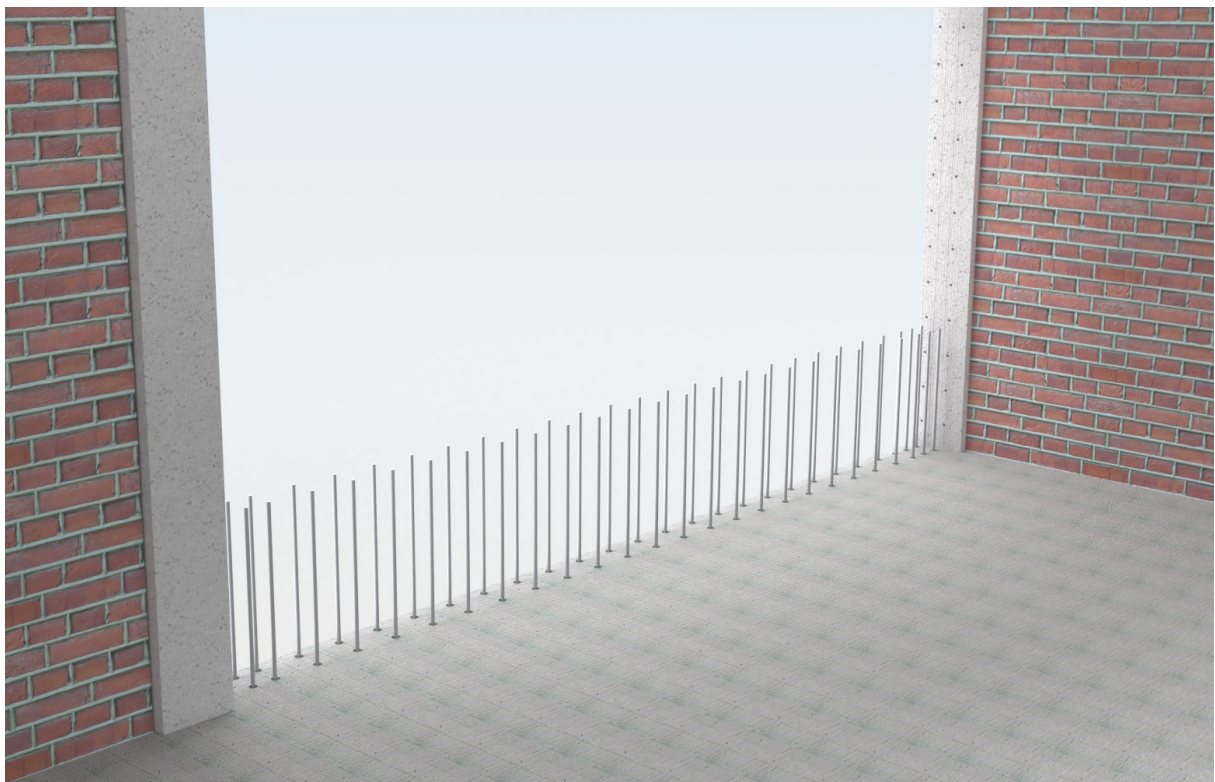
Step 1: In this step, the infill bricks of the wall are taken out to make space for the new retrofit shear wall system.
